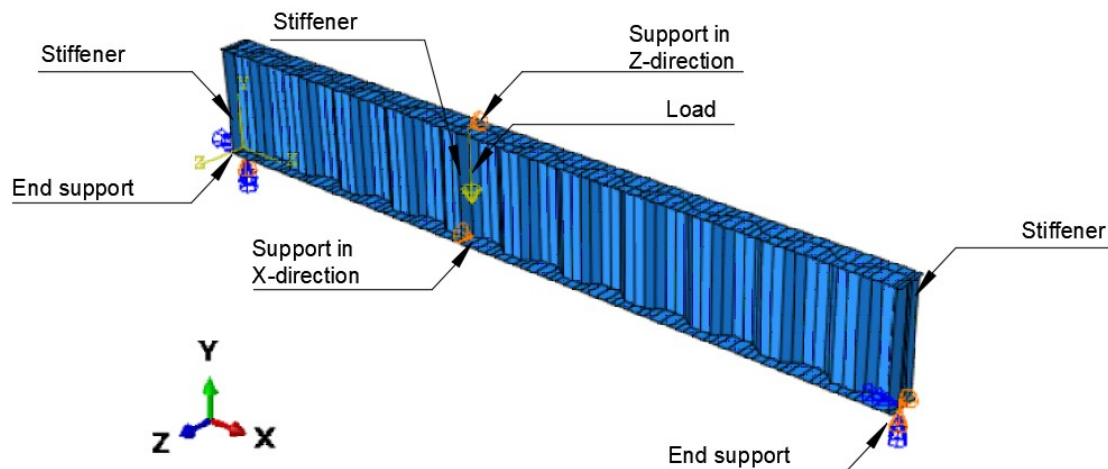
Boundary conditions and loading point for girder G7A (Test specimen performed by Driver et al., dimensions are illustrated in section 3.6.1)
